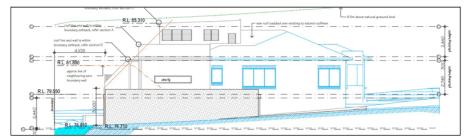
Eastern elevation, facing 6A Minallo Ave and 14 Lochner St. Existing development is shown in blue.
